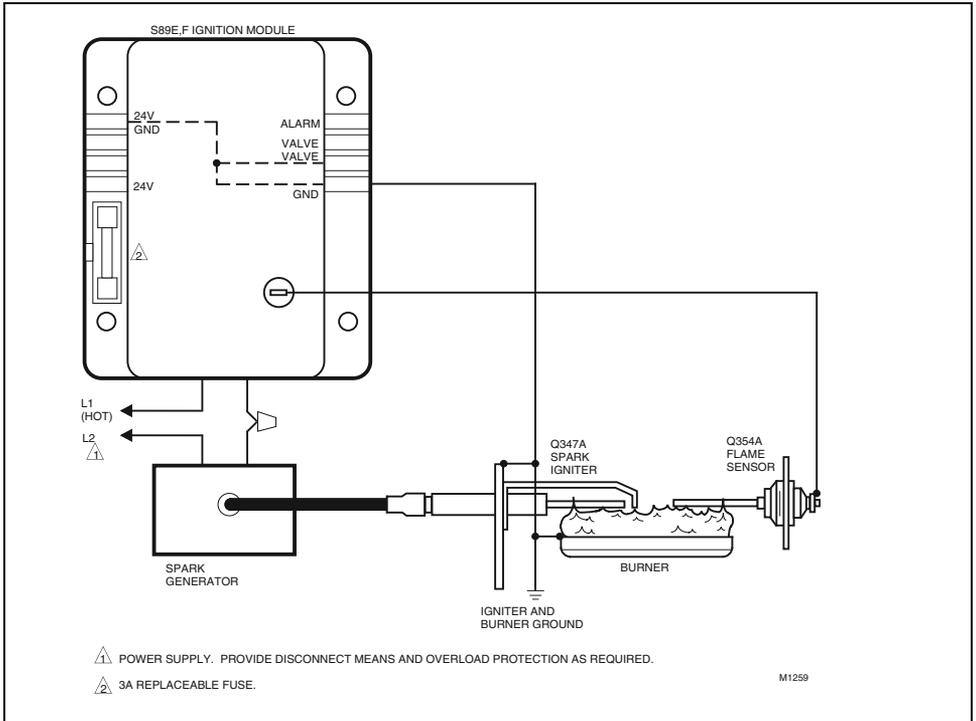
Q347A; S89E, F; and Q354A typical wiring connection.
